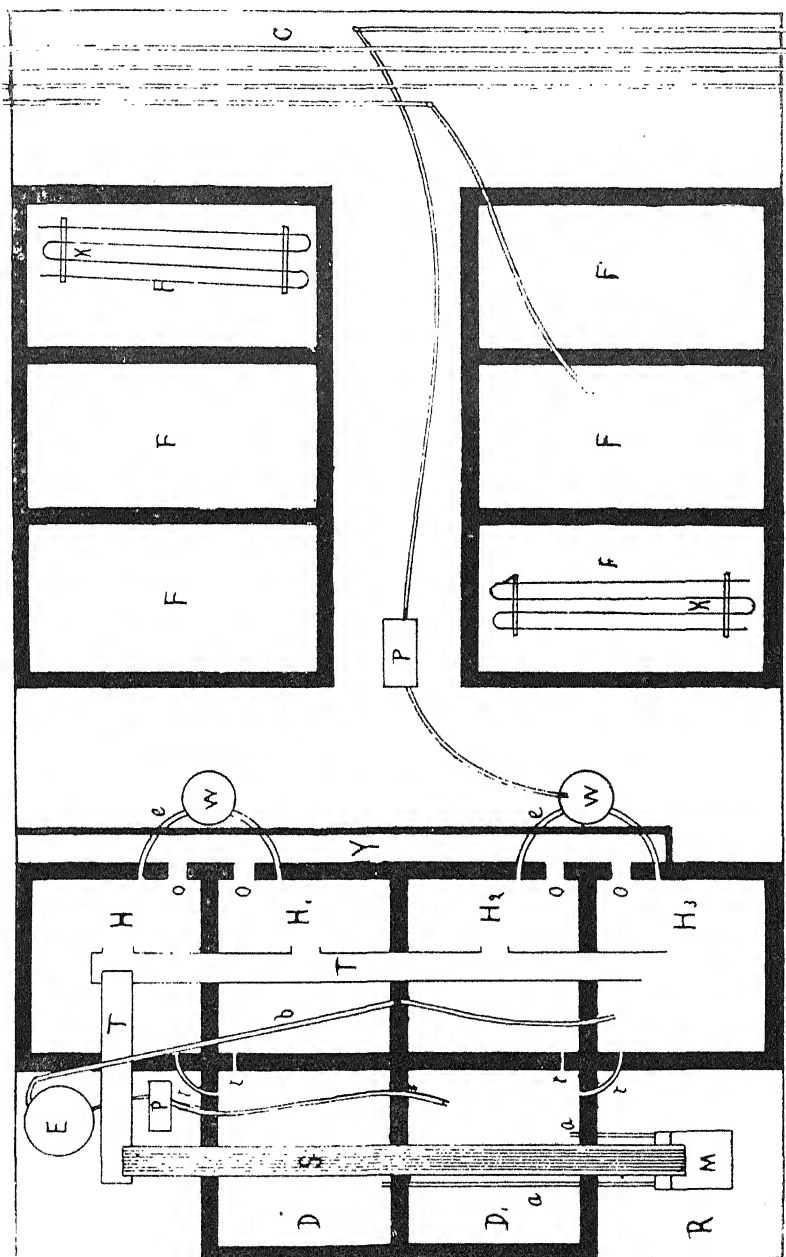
GROUND PLAN OF CRUSHING, EXTRACTION, AND FERMENTING ROOM.
